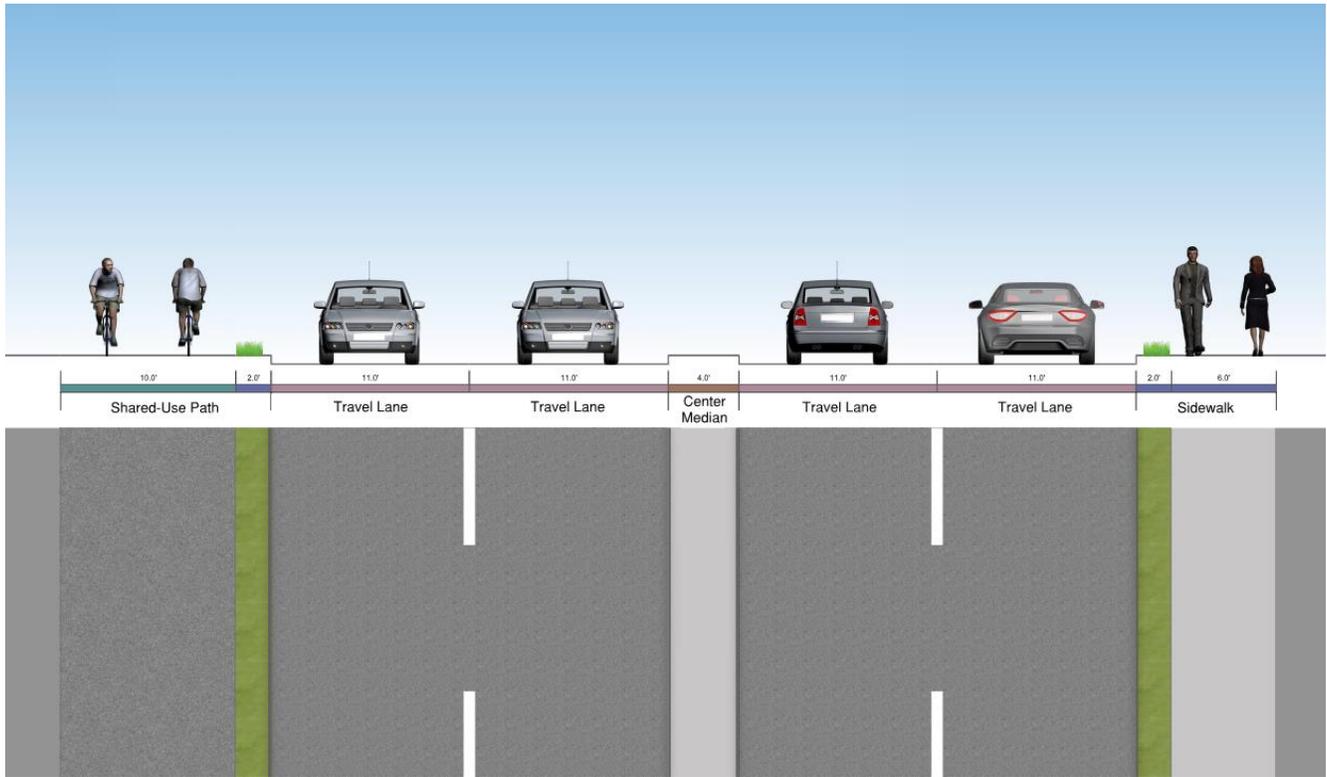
Woolford Road/Central Avenue Cross-Section C (68')
